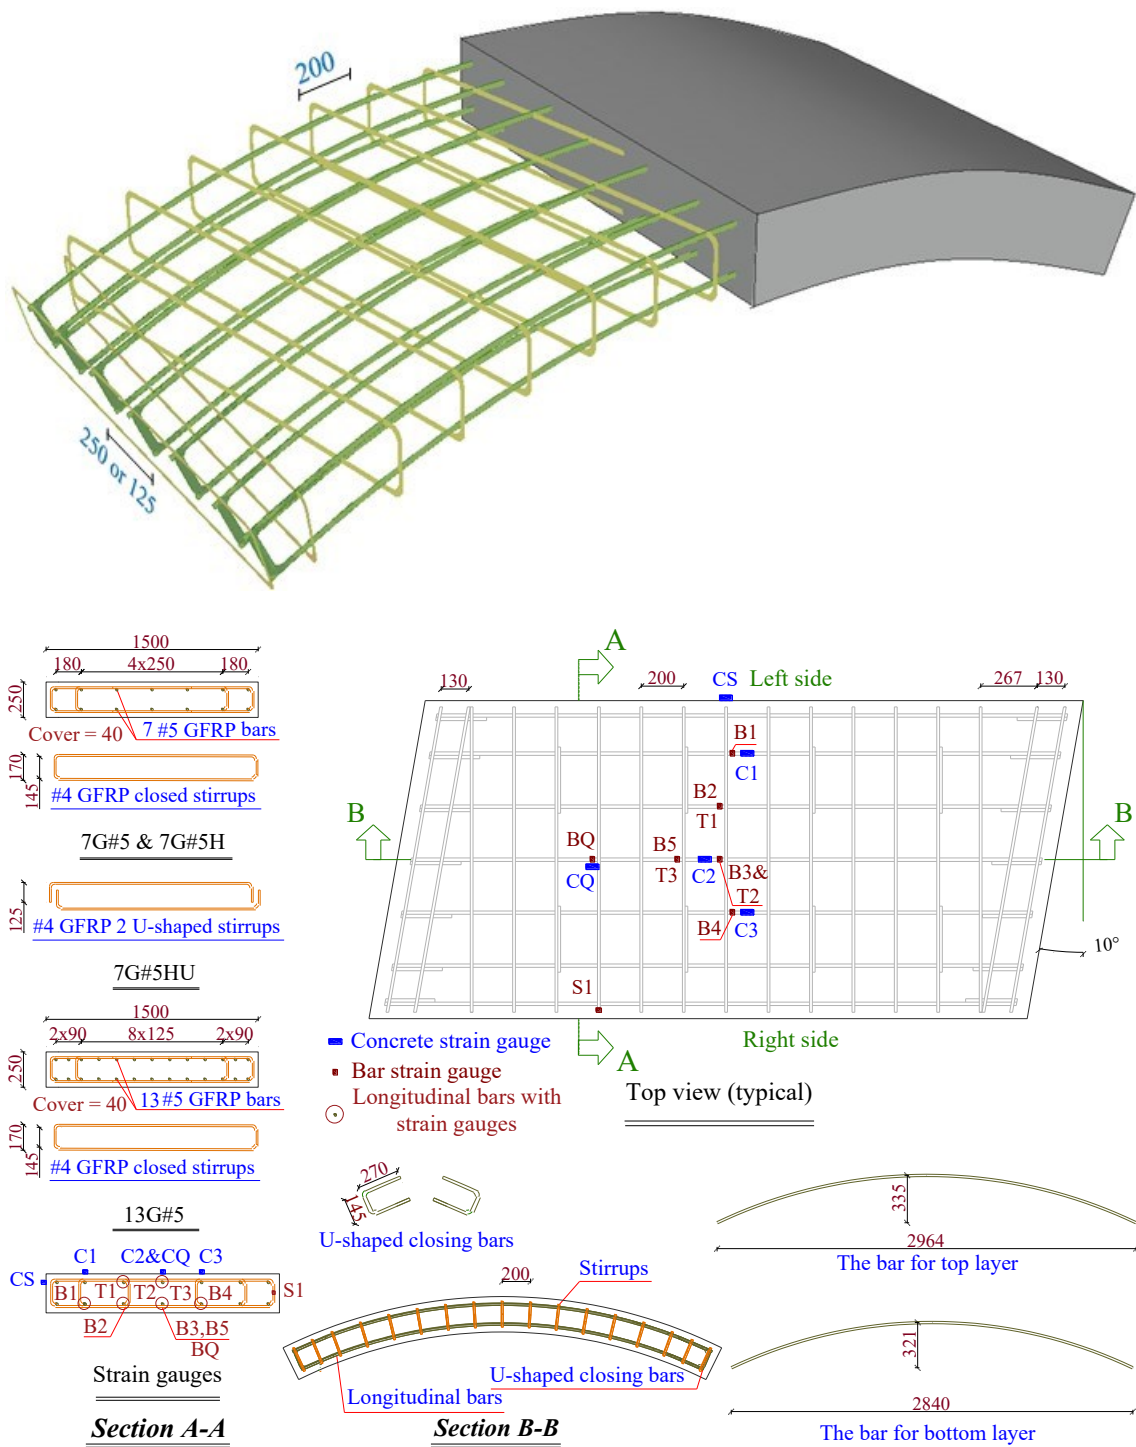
Reinforcement details of the specimens and strain-gauge locations (dimensions are in mm).
